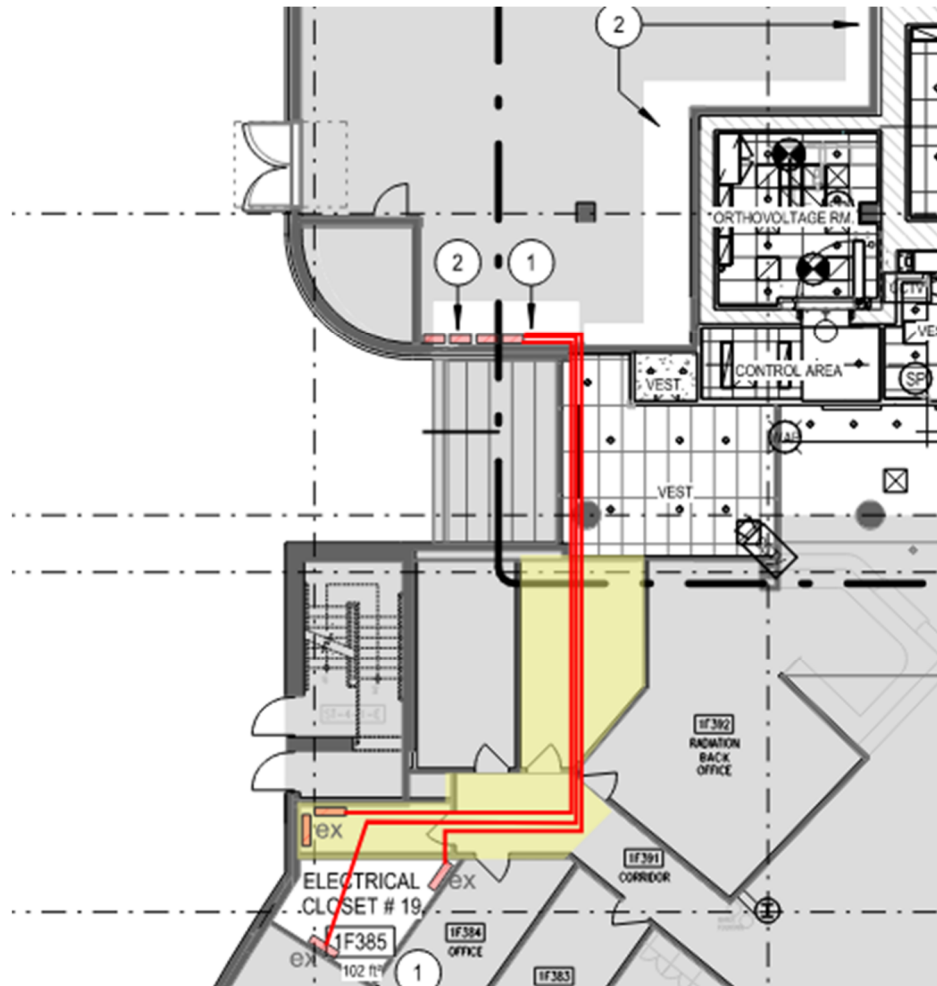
Ceiling Scope around Halcyon 3
